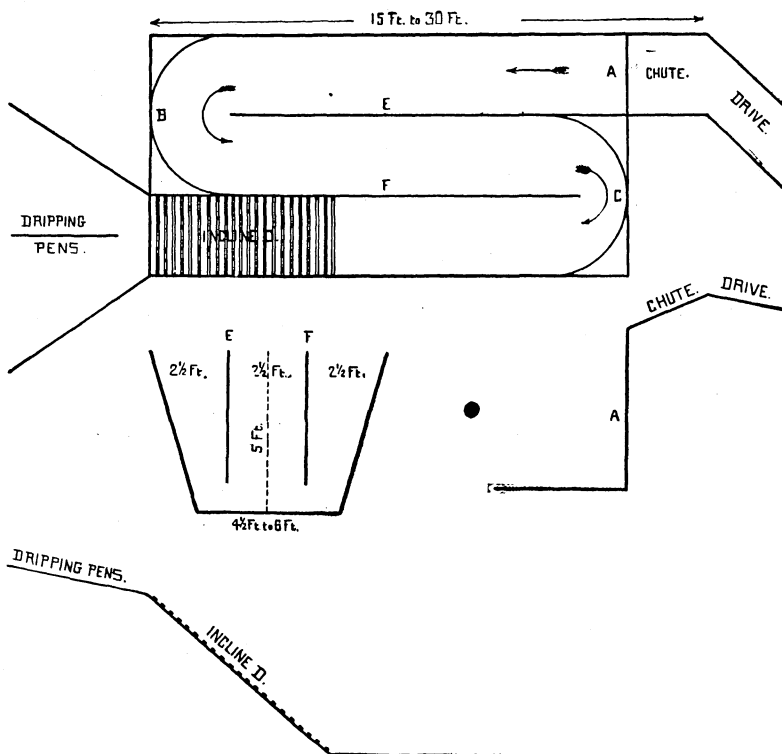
A triple vat. The various diagrams give surface view, cross section, vertical section of entrance to the vat, and vertical section of the incline and dripping pens.
